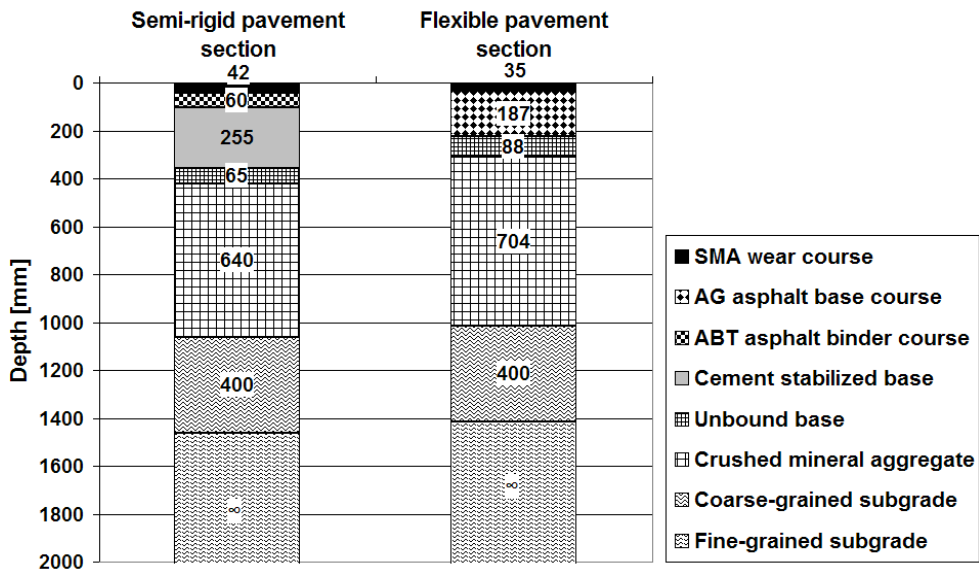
The pavement structure of the in-service test sections (Paper II).
